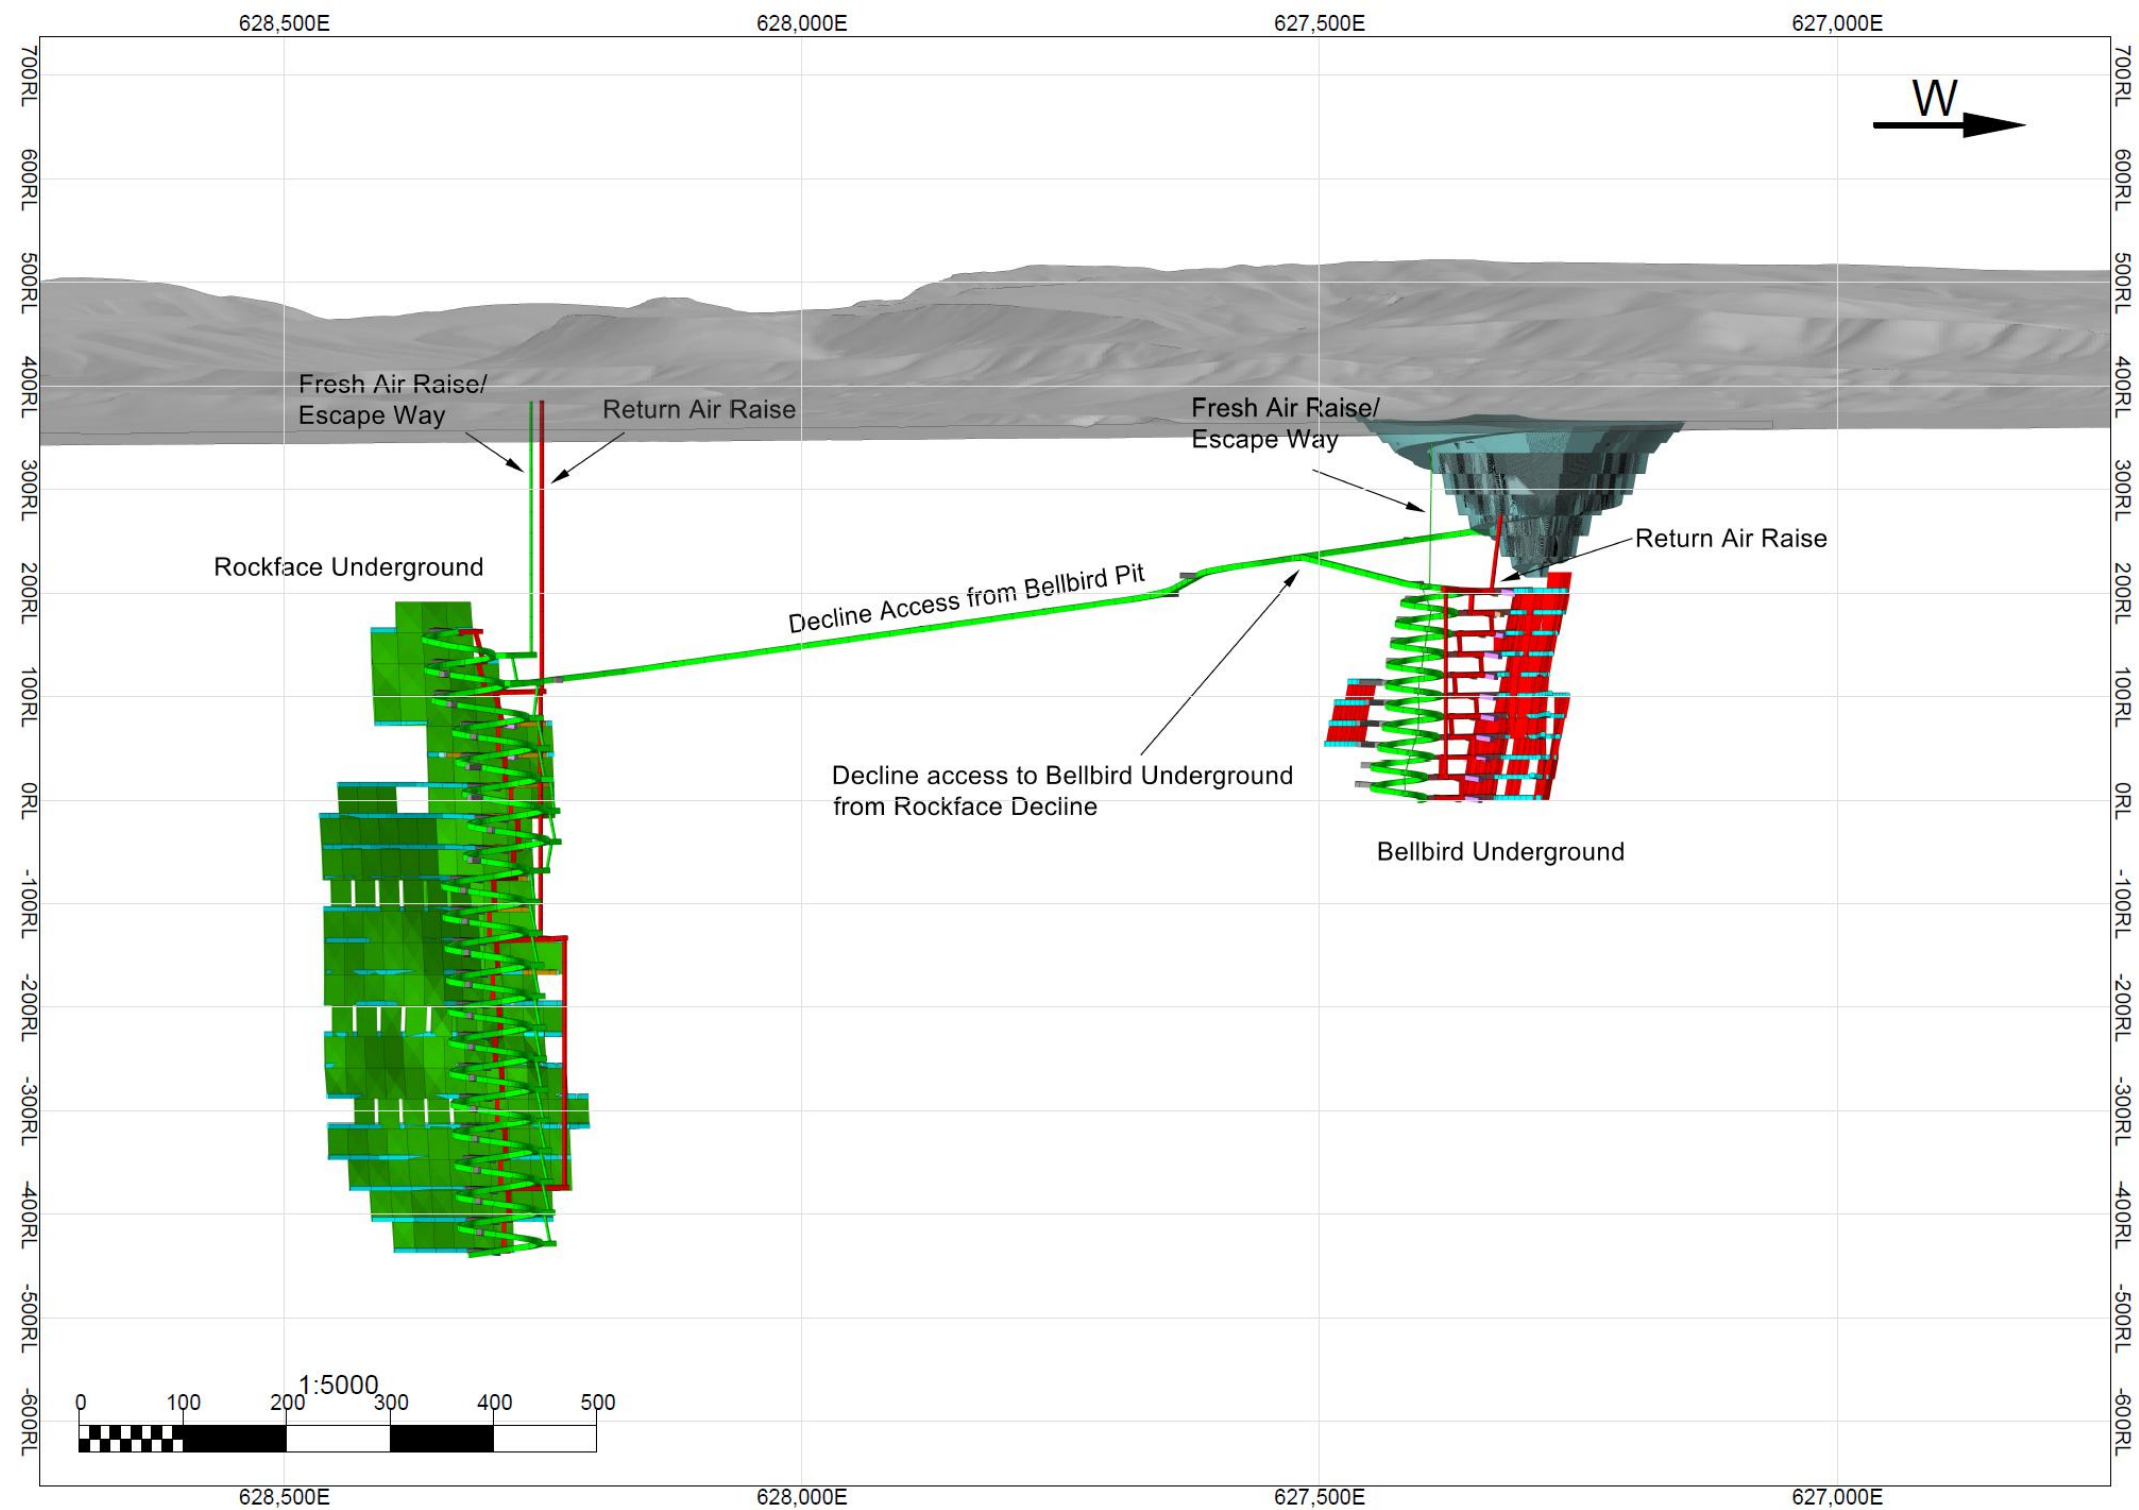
Rockface and Bellbird Underground Mine Design – looking West
